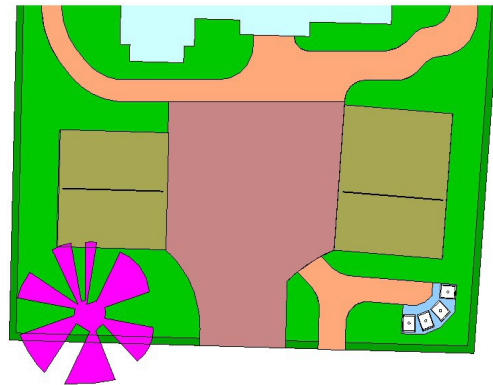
above shows the maximum 11% overlap of the proposed development's footprint with the RPA of Ash tree (T6)
